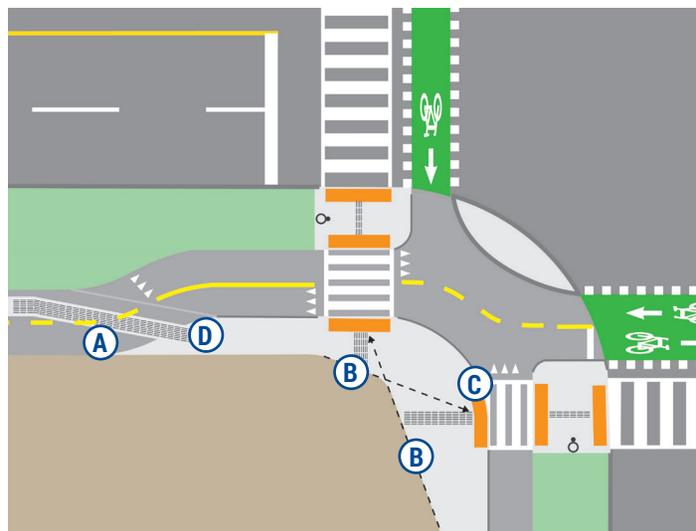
Standard protected corner showing transition from multi-use path to separated facilities and pedestrian path of travel alignment with crosswalks
